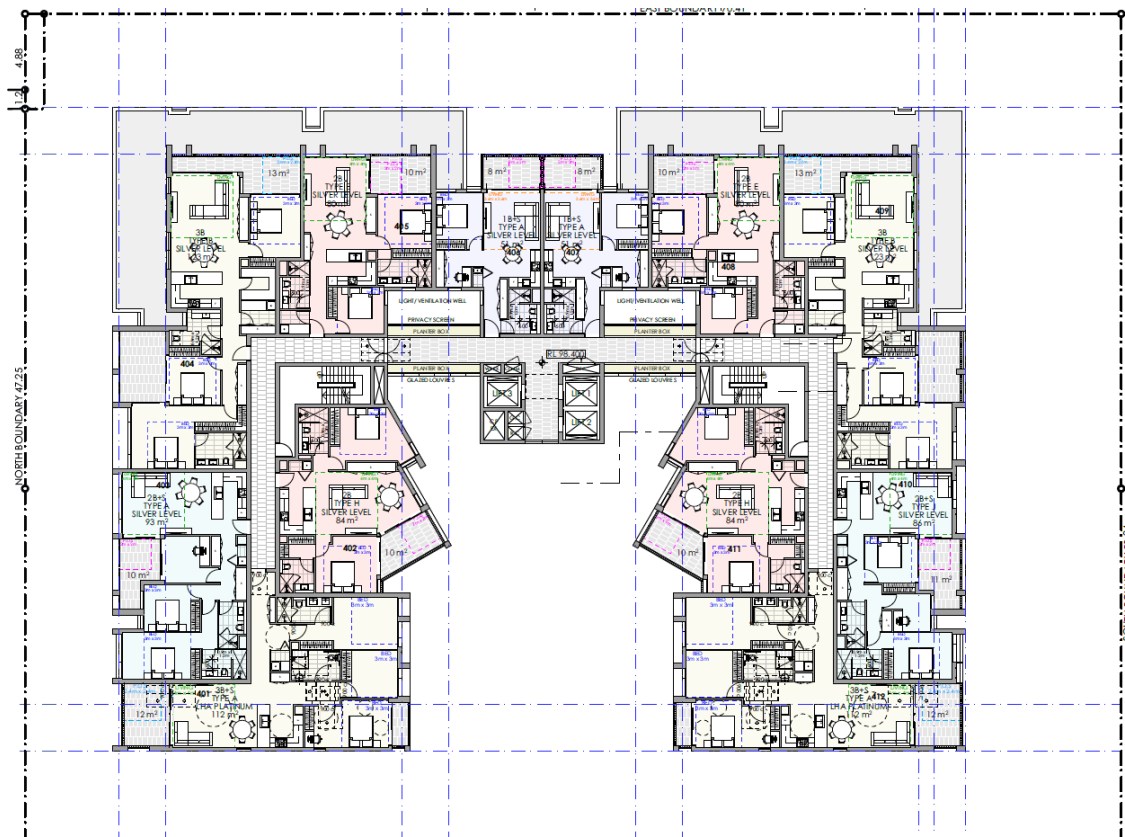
Level 4 - general layout floor plan (Source: PTI Architecture)
